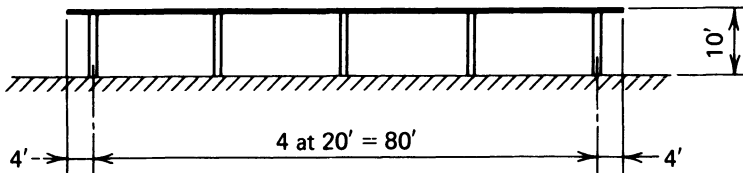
Elevation of single-story building having a 6 in. one-way slab roof supported by bearing walls, used in Problem 6.
